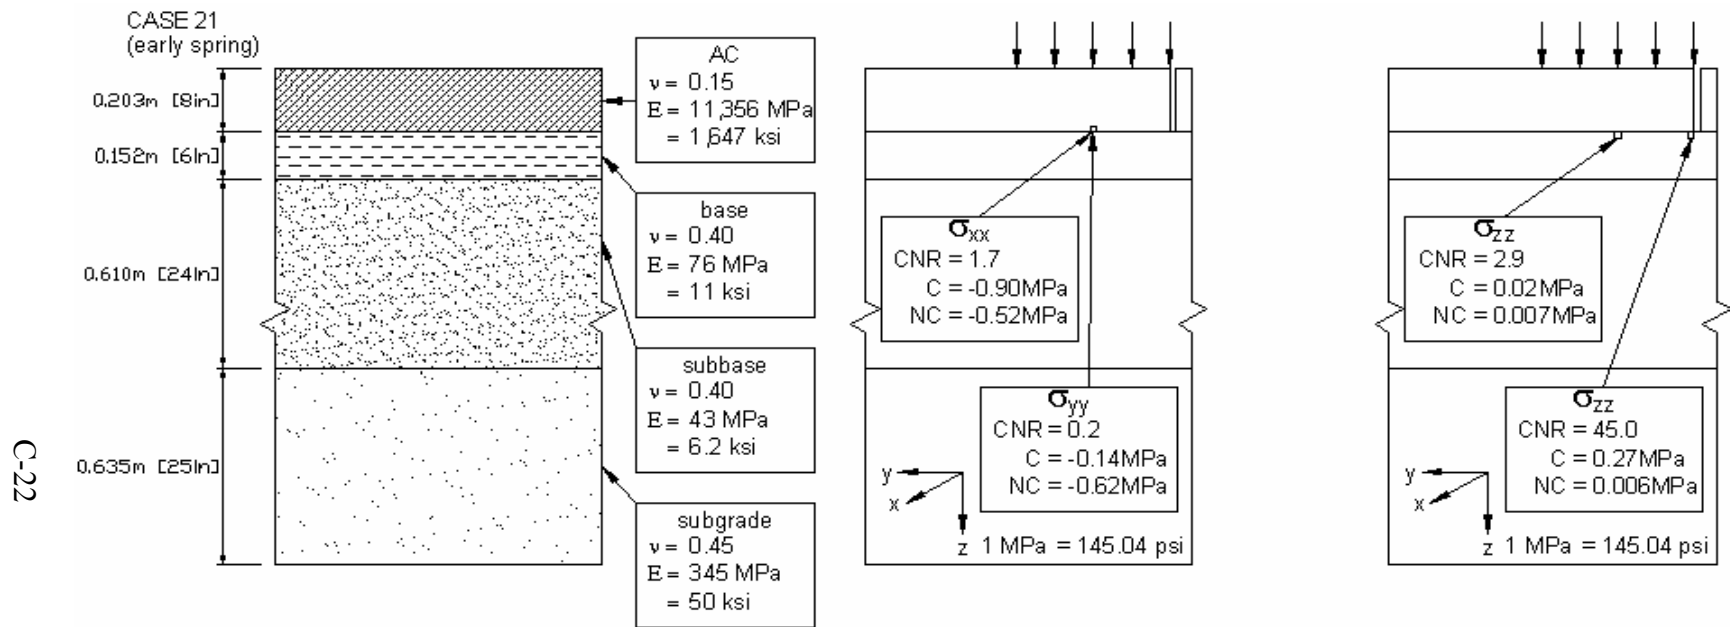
Summary cross section for case 21, (C – stress in cracked pavement, NC – stress in pavement with no crack, CNR – crack/no crack (stress) ratio)
